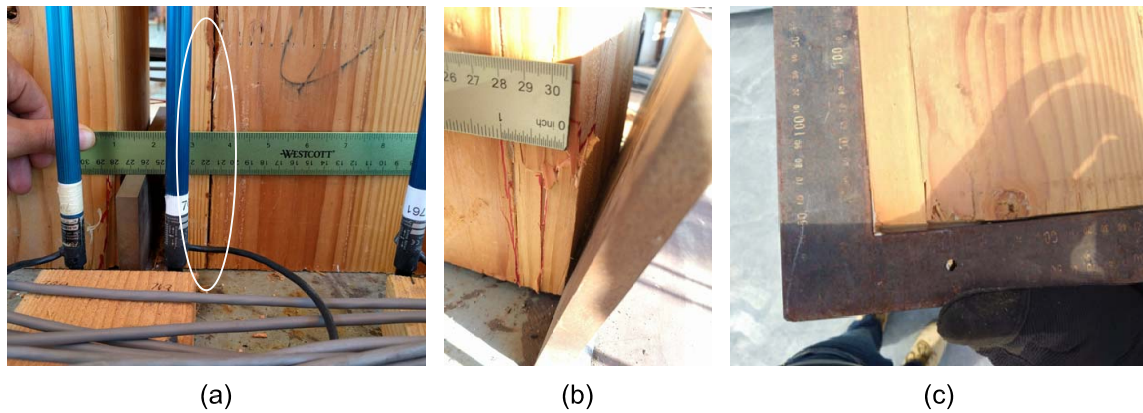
Photos of CLT rocking wall base corners with minimal (a) laminate spreading (b) crushing and (c) minimal damage at corners after the walls were removed from structure
